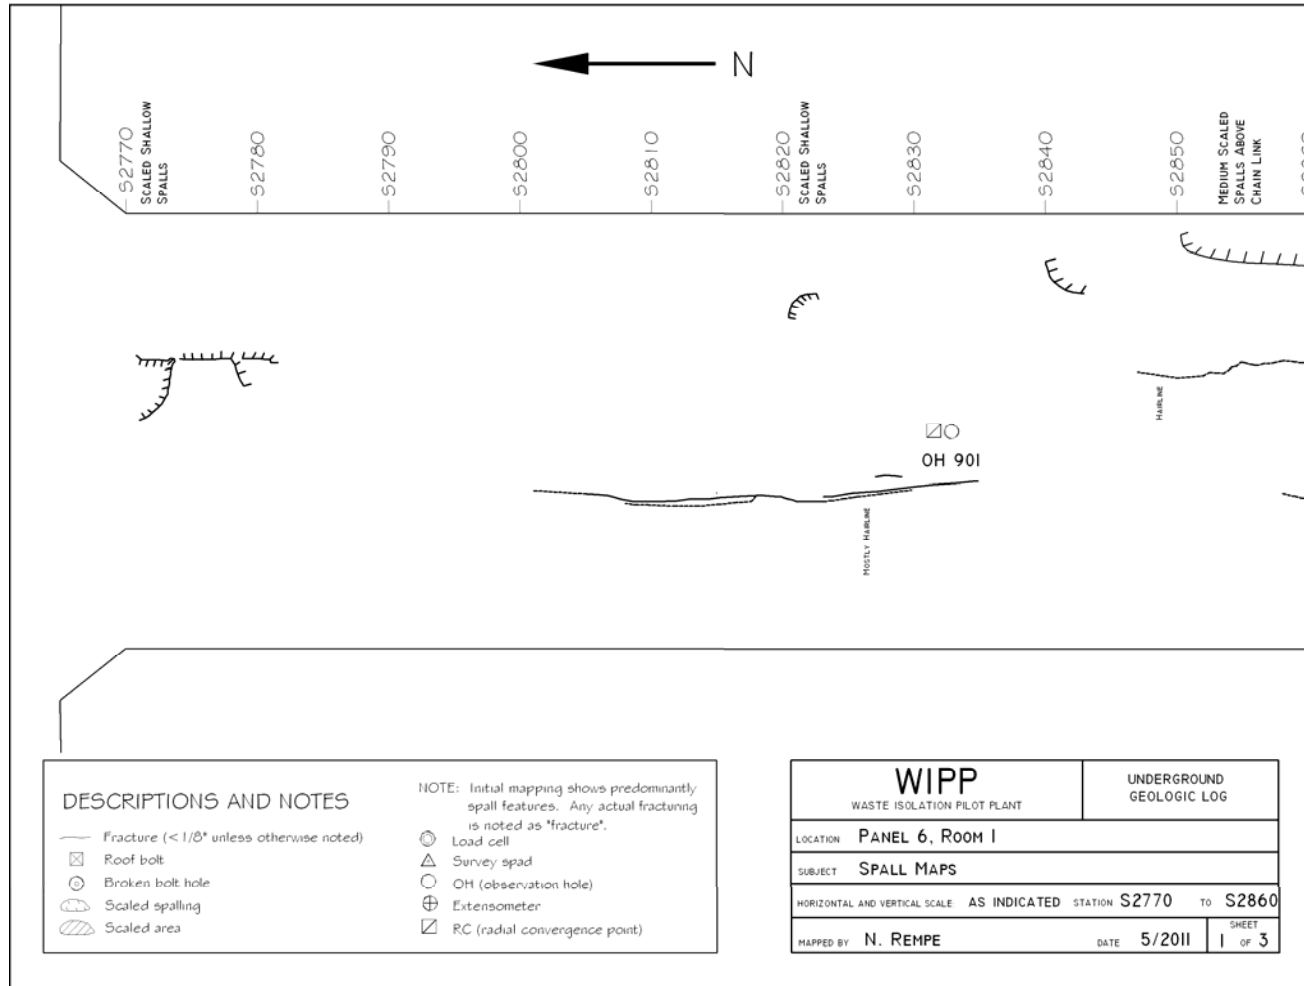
Panel 6 Room 1, S2770 S3060 Roof Fractures (Sheet 1 of 3)
